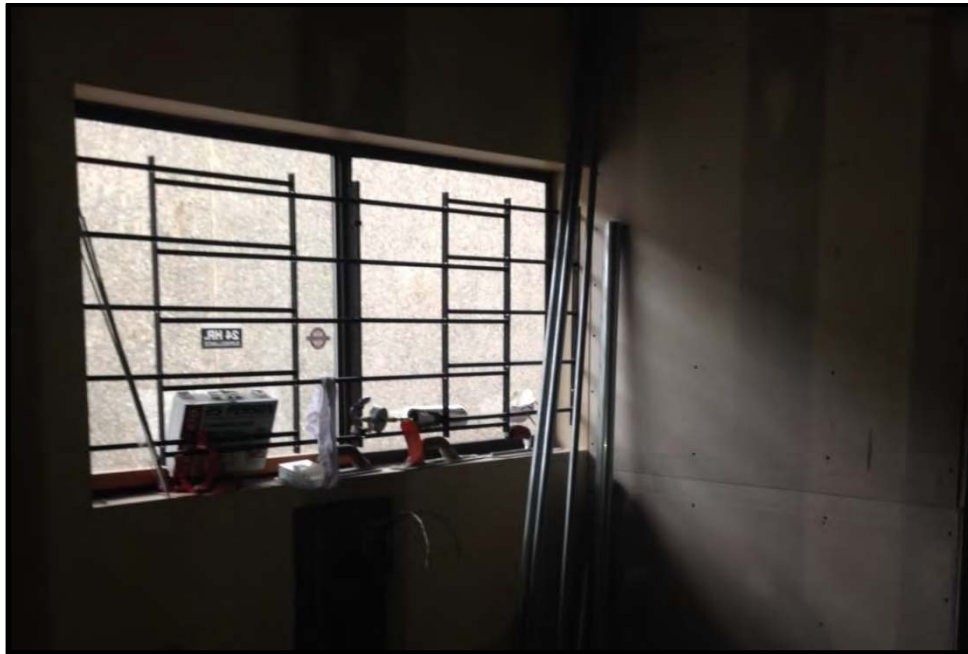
Looking at the east wall of suite 550 and the location of summa canister 550B.
